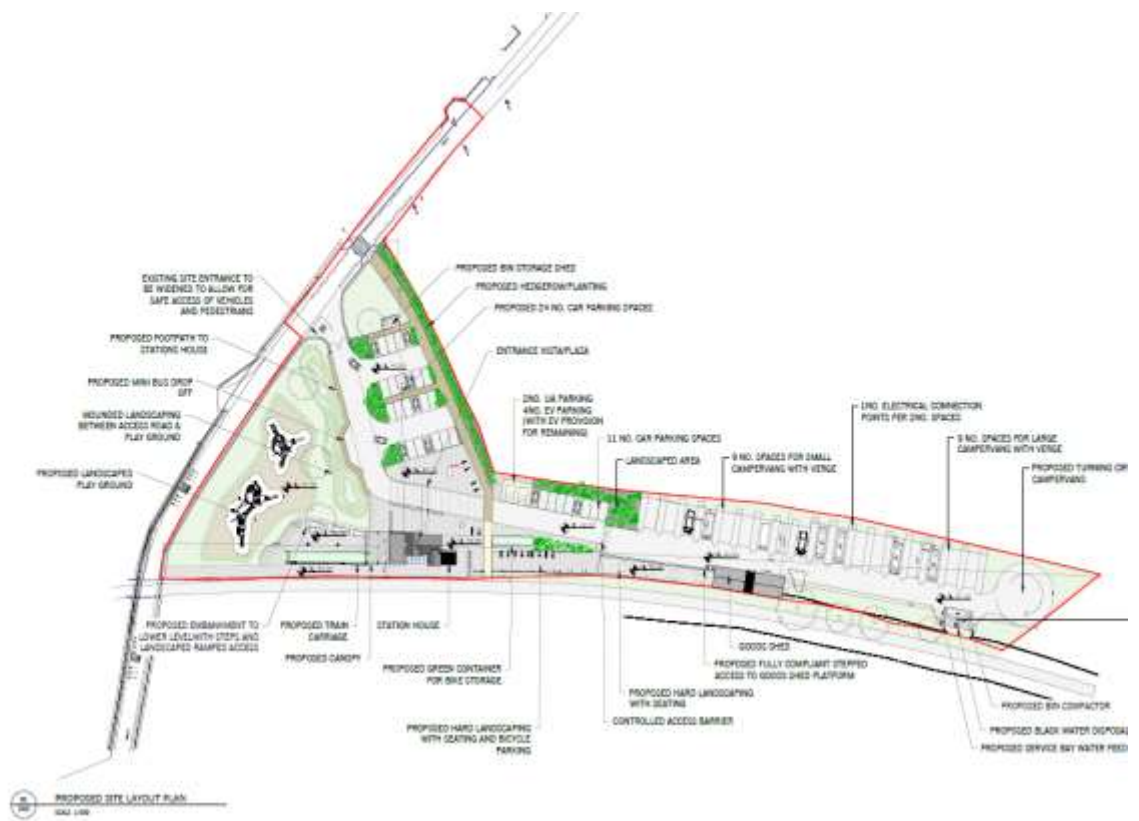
Limerick Greenway Hub @ Ardagh Layout Plan
